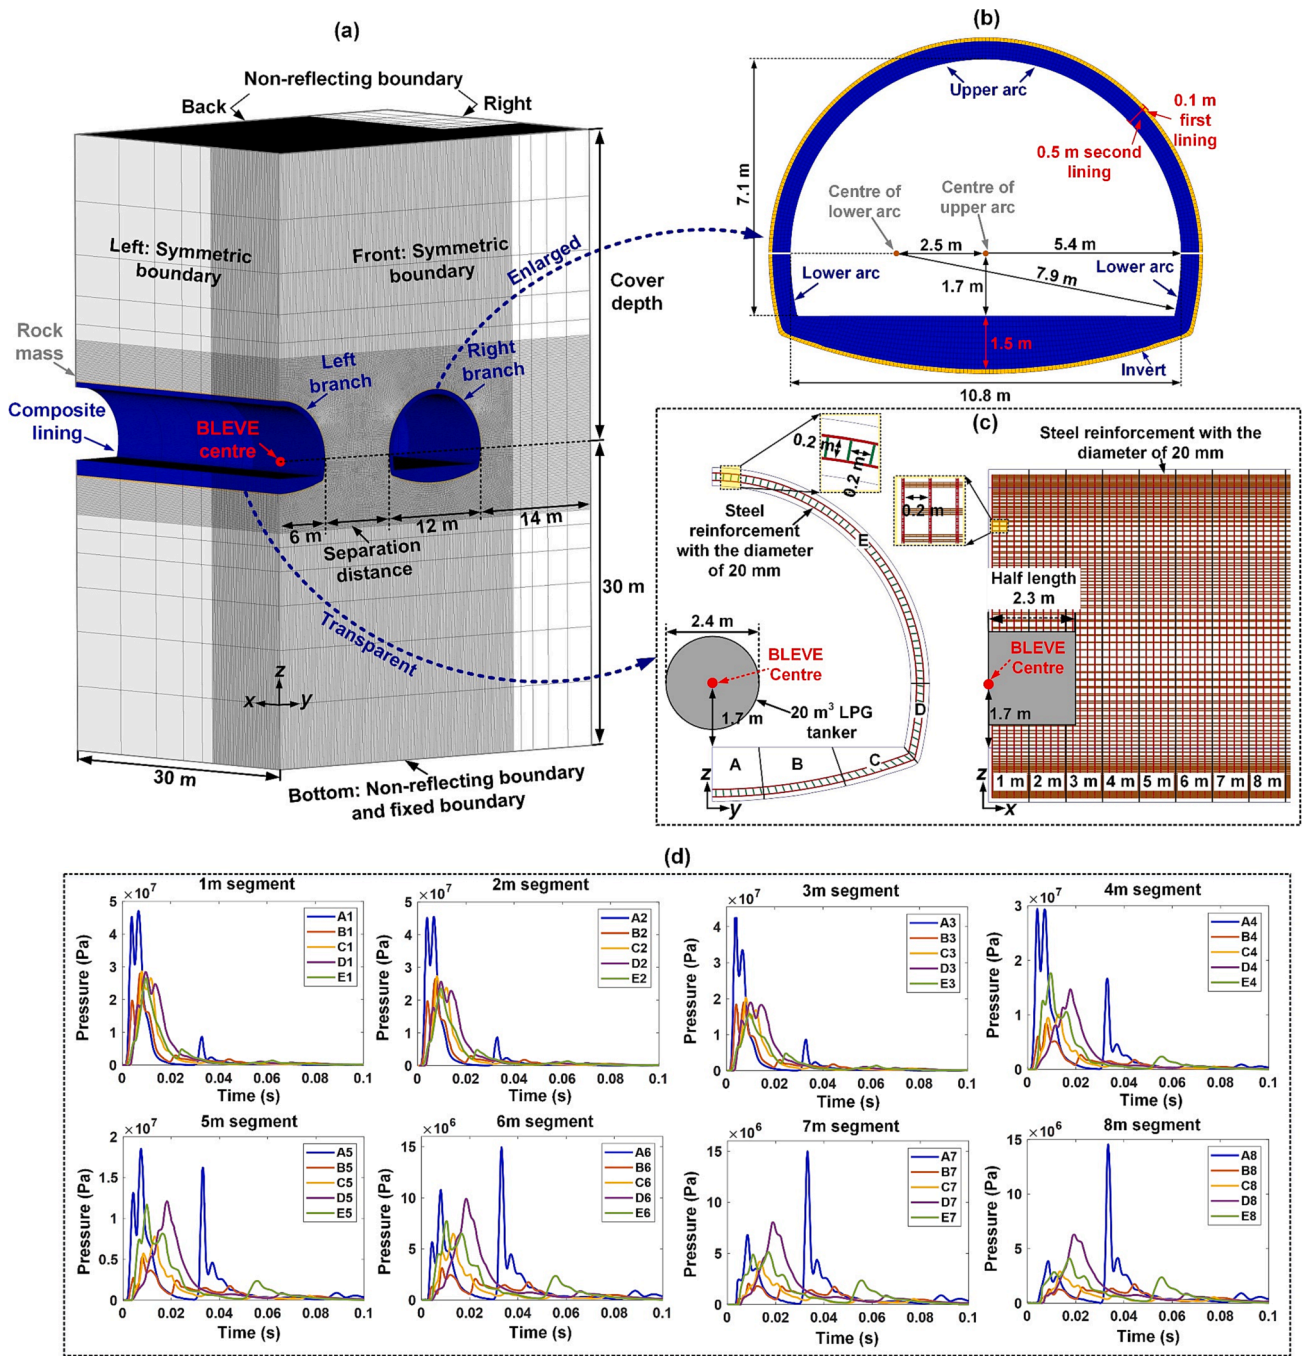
Finite element model of twin tunnels and BLEVE scenario inside tunnel, (a) finite element model, (b) geometric configurations of tunnel and details of lining, (c) BLEVE loading divisions and reinforcement configurations, (d) BLEVE loads at different division segments (Cheng et al., 2022a).
